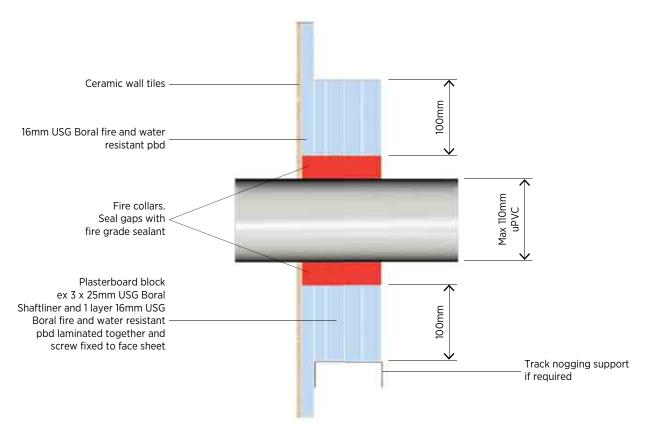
Penetration Detail - uPVC Pipe - Twin Stud - FRL 60/60/60
